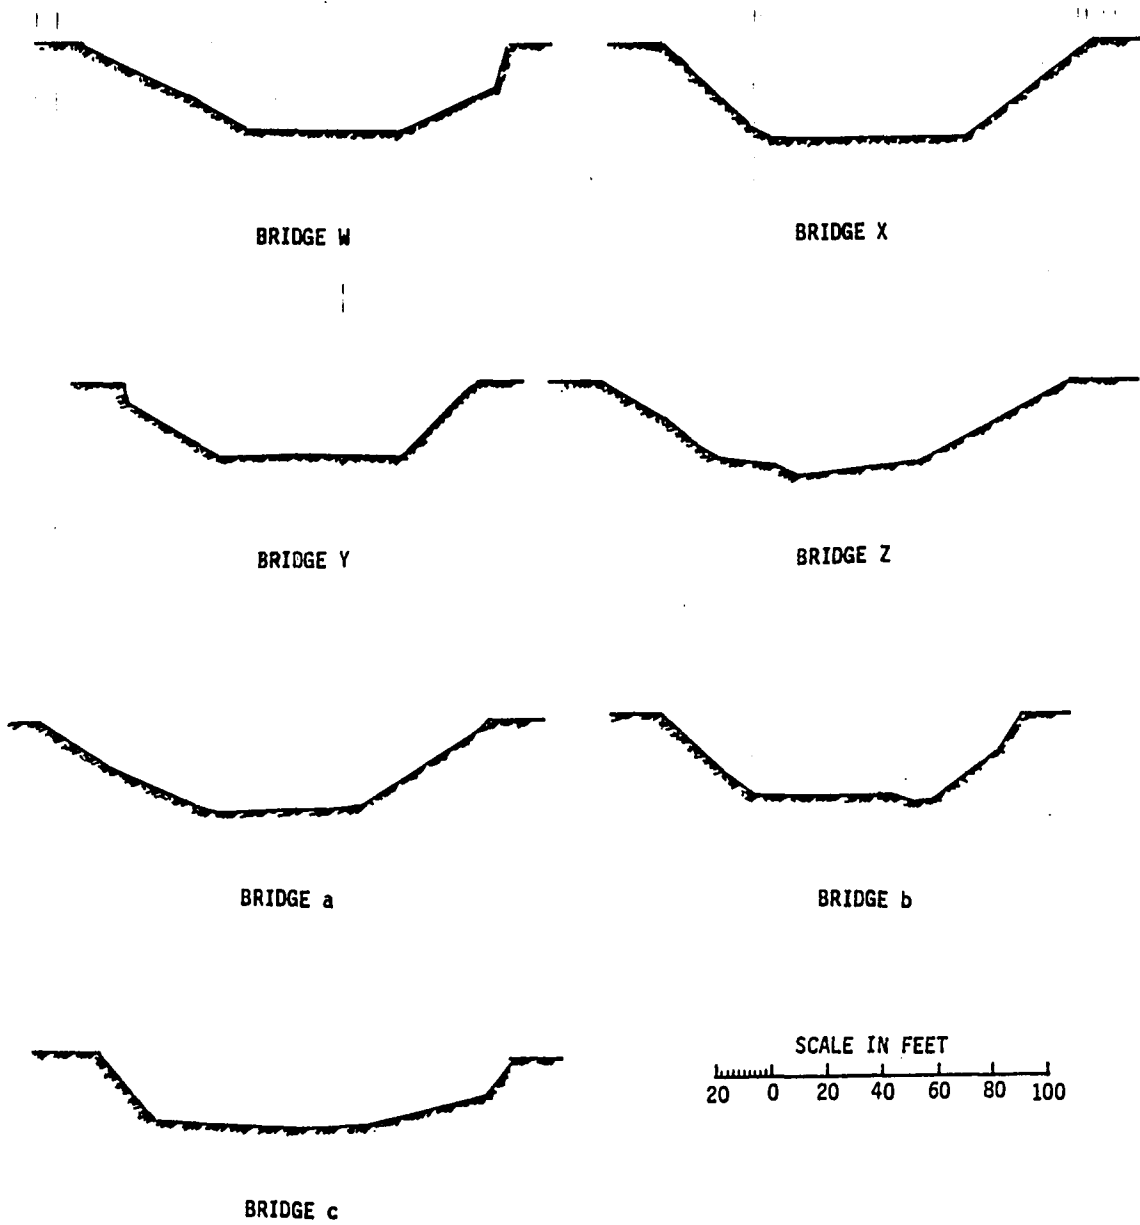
Cross section of the Willow Creek at bridge crossings in 1966 for bridges W, X, Y, Z, a, b, and c
